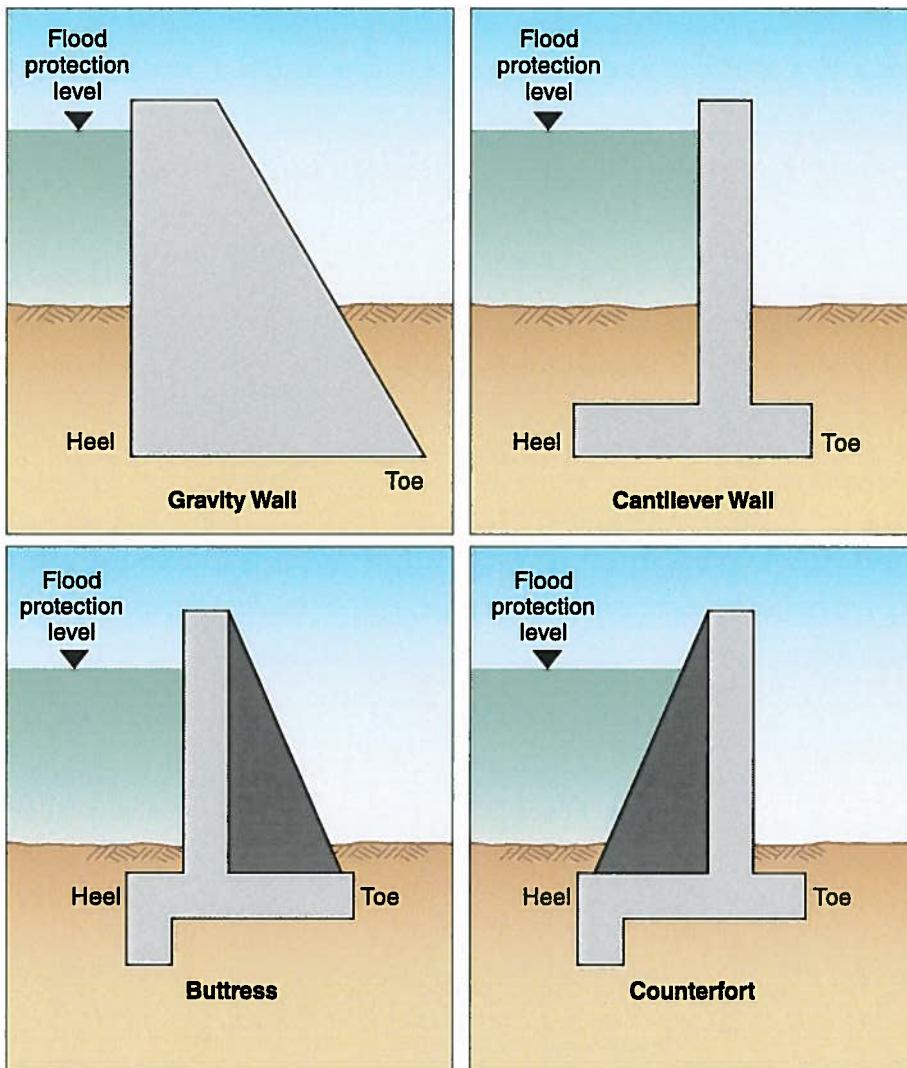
Gravity, cantilever, buttress, and counterfort floodwalls
